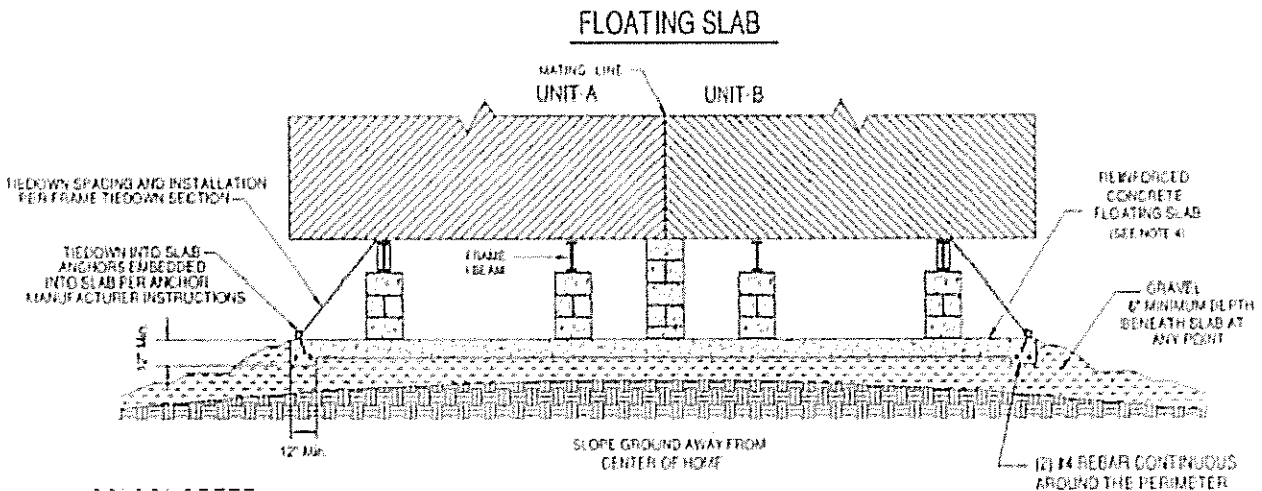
Installation detail for Example #3 (“Floating Slab” FFF)
